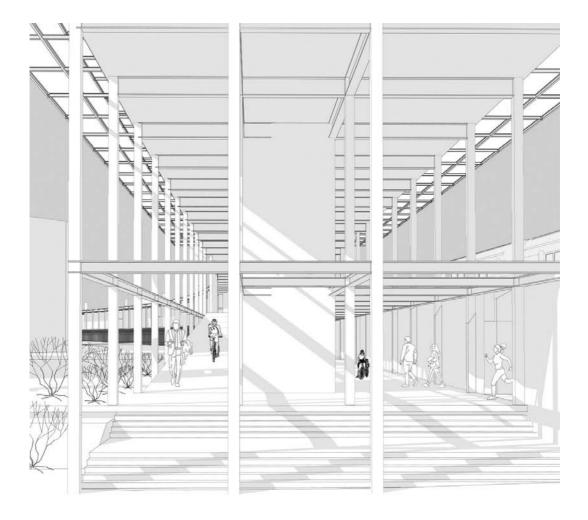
View from the river to the base of the structure. The tunnel to the right is used to access the bike / pedestrian bridge to Luzern. The ramp to the left is accessing the Gallery.
